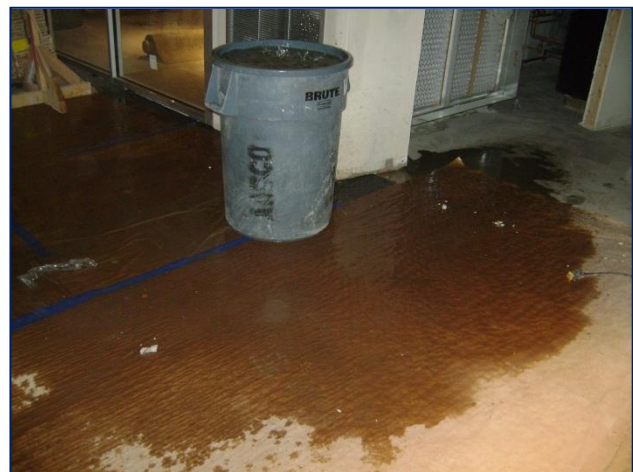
Roof Leak After a Severe Rain Storm; Picture Taken by Clara Watson
